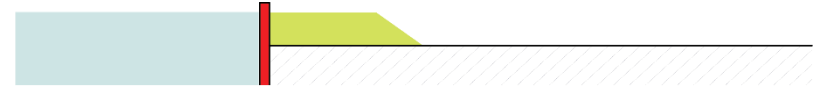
Visual of elevating a seawall and creating new Harborwalk connections along the waterfront.
